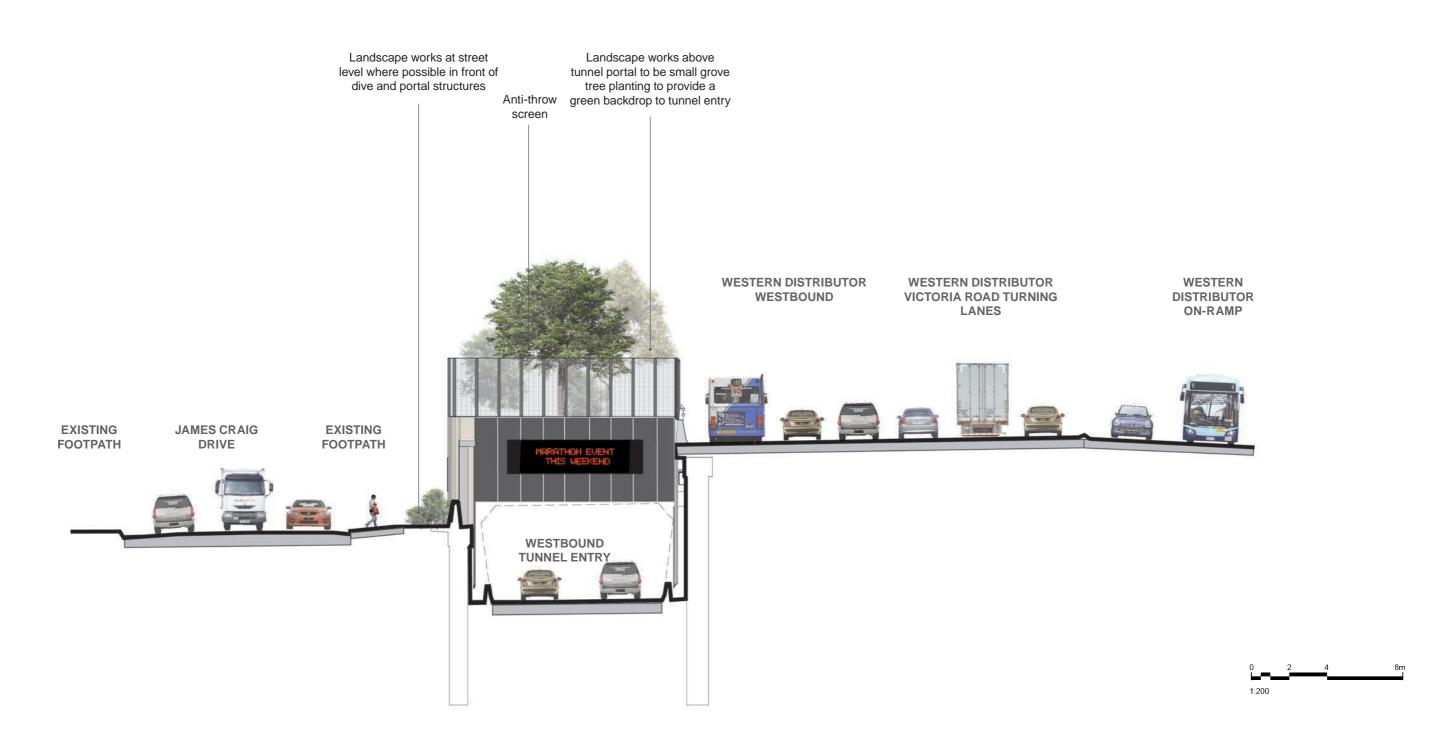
M4-Anzac Entry Portal - Tunnel portal elevation
